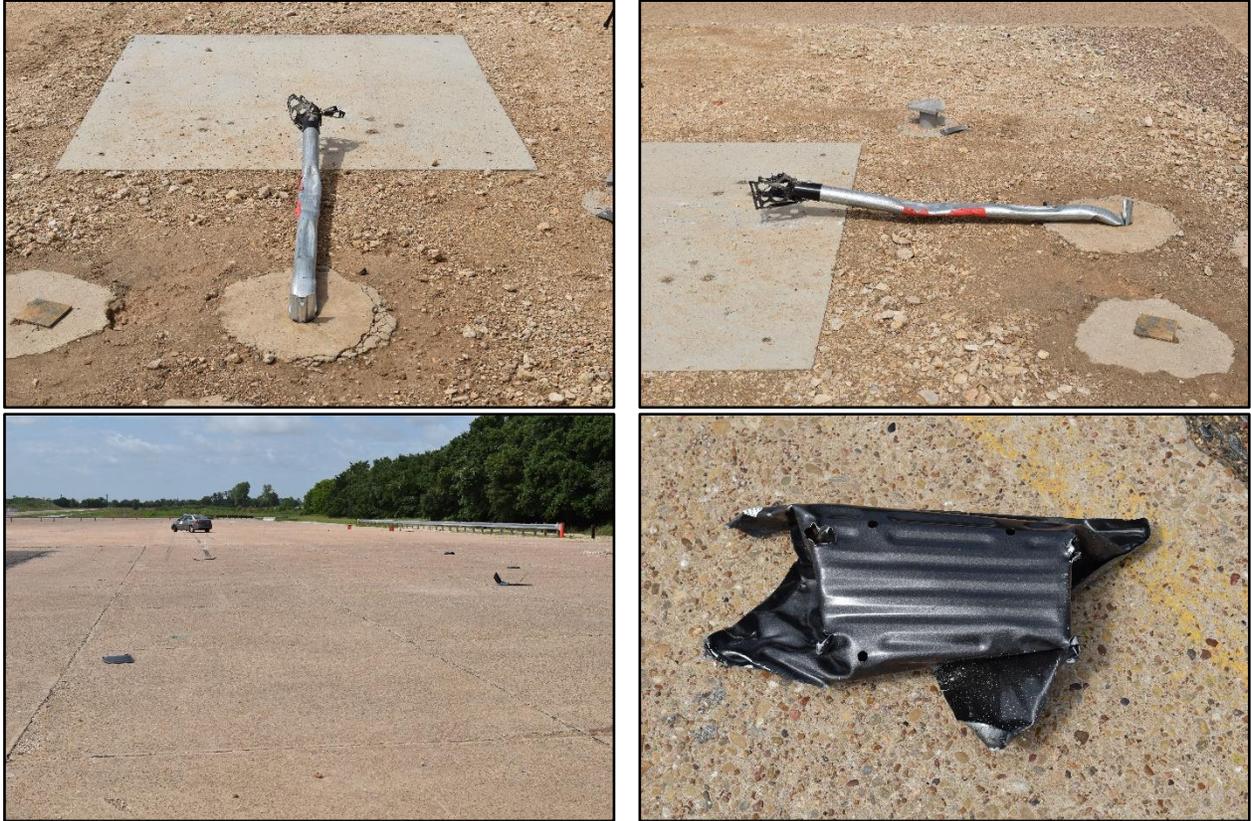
Extra-Large Mailbox on Thin-Wall Galvanized Tube with Type 2 Foundation after Test No. 469469-10-2.
